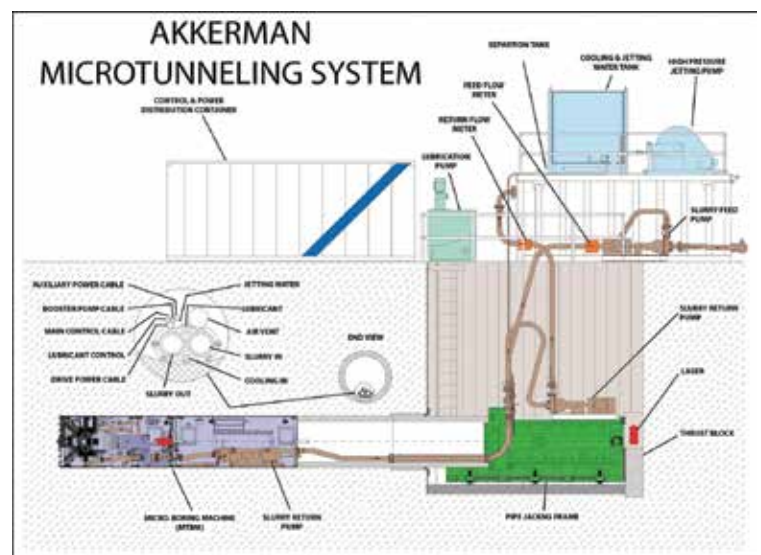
Slurry microtunneling with slurry spoil removal.
